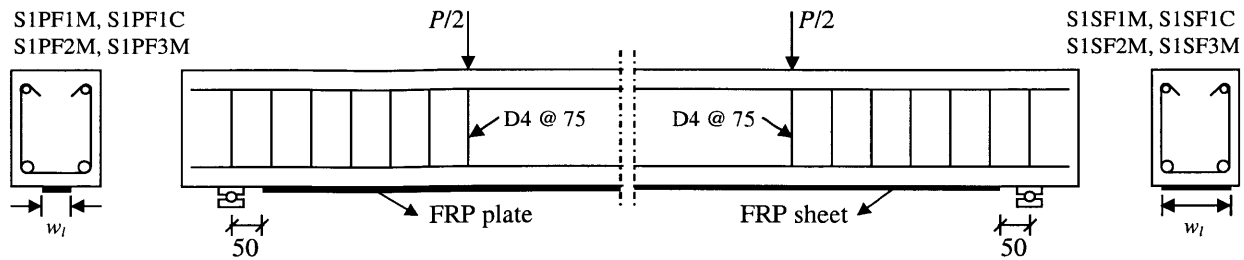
Typical strengthening configuration for beams in Set I (mm)
